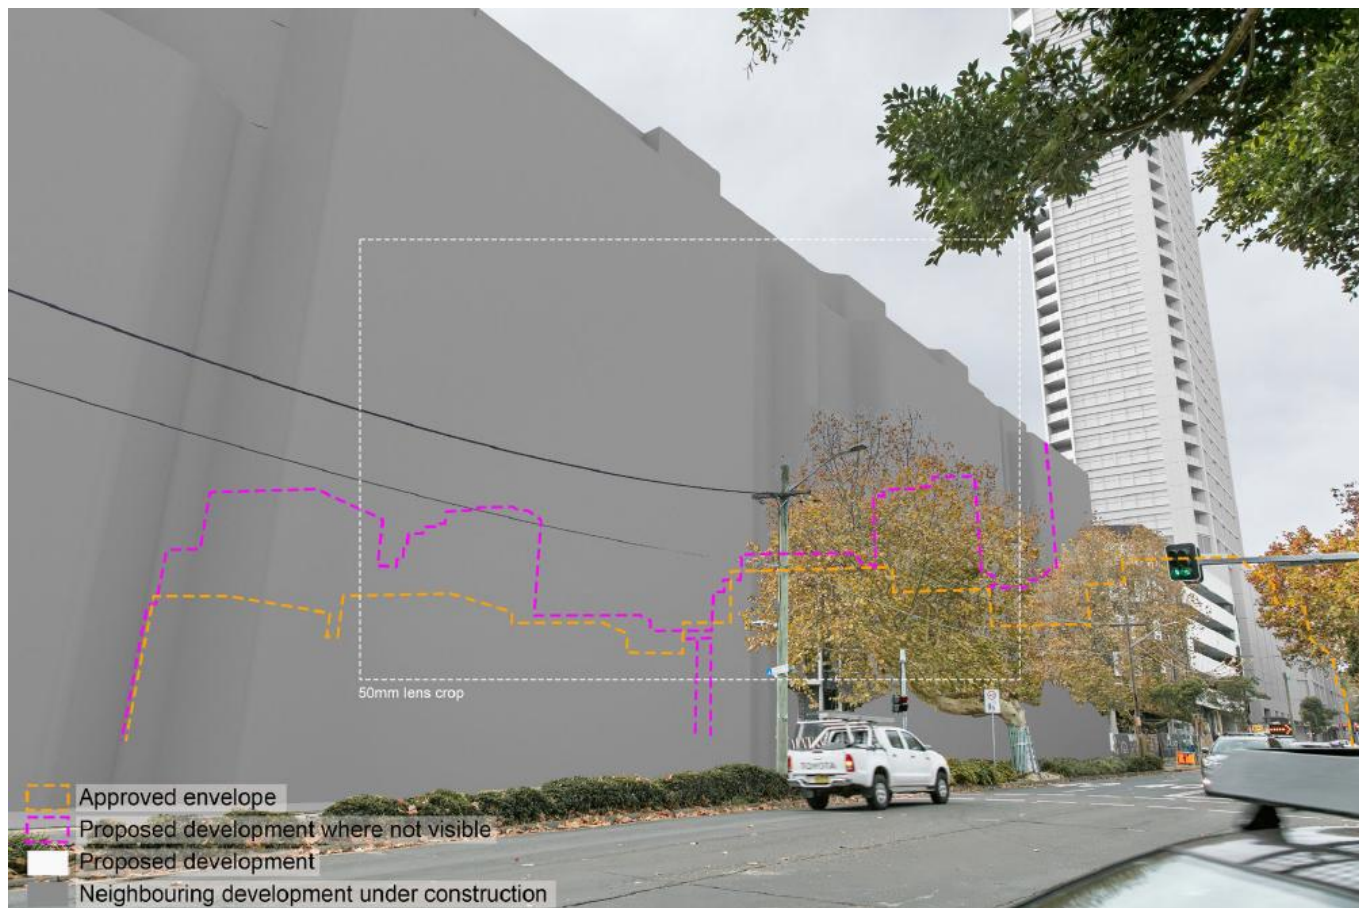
Viewpoint 2: Bourke Street – proposed view also showing approved envelope
